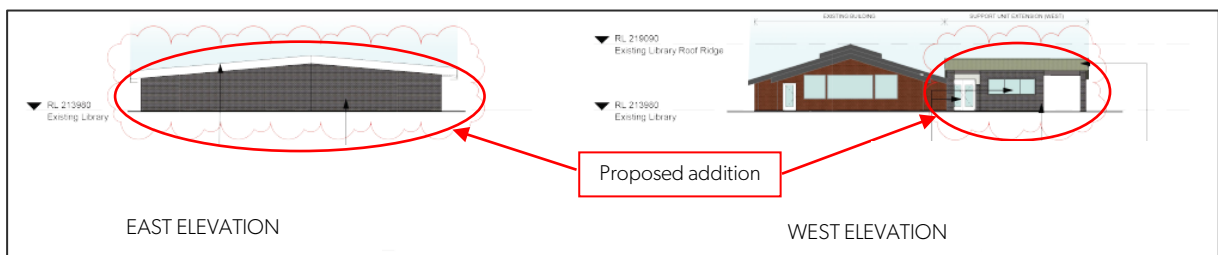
| Proposed east and west elevations of support unit building extension (source: Section 4.55 Modification Application, 2019)
